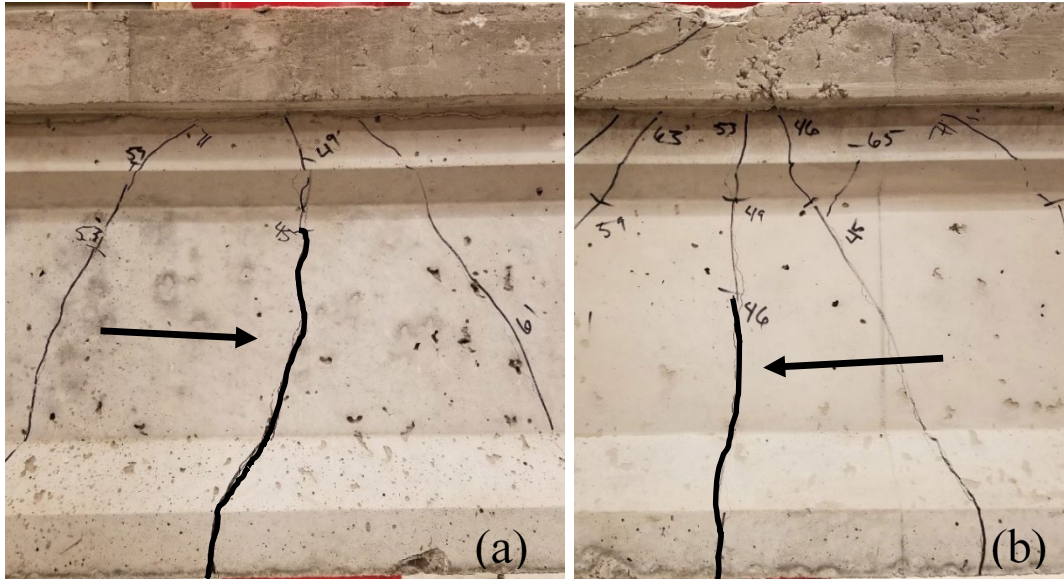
Initial flexural cracking under the load point on the RC3-N girder at 45 kips of load (a) and initial flexural cracking under the load point on the RC3-S girder at 46 kips of load (b). Arrows point to the dark lines that indicate the initial flexural cracks.
